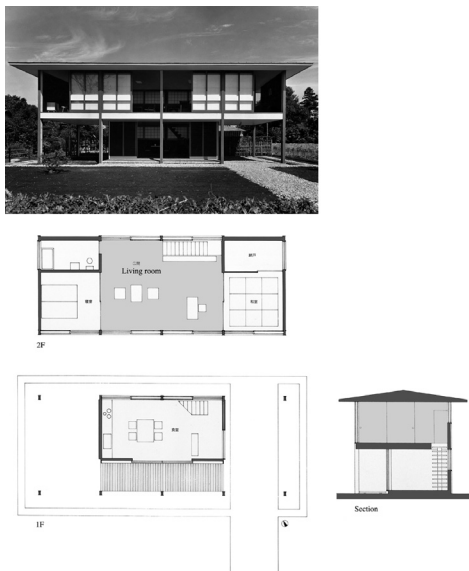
Shinohara Kazuo, House in Kugayama, Tokyo, 1954. Main façade (photograph ©Hirayama Chūji), plans and section adapted by the author from Shinohara 1996.
